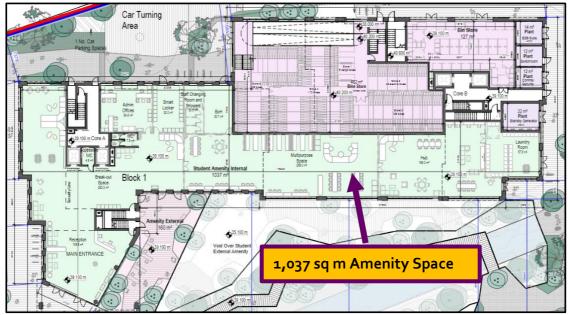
Location of Amenity Space on Ground Floor Level in Block 1
